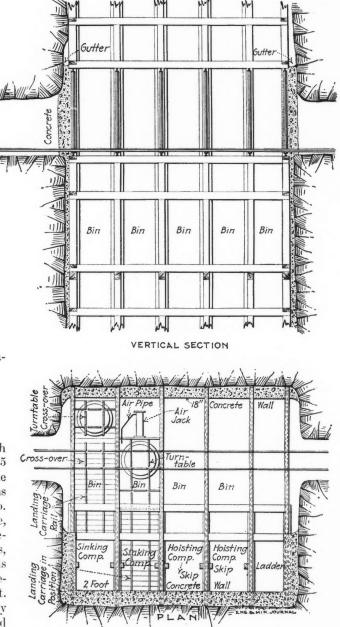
LAYOUT OF HANCOCK NO. 2 SHAFT STATION
